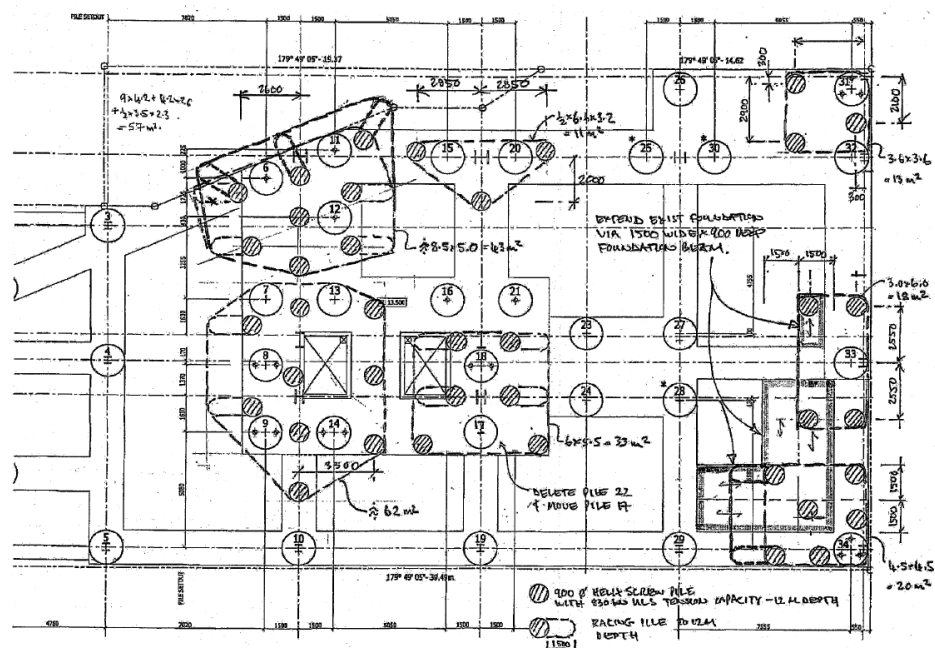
Foundation Plan (Christchurch City Council 2016b)
